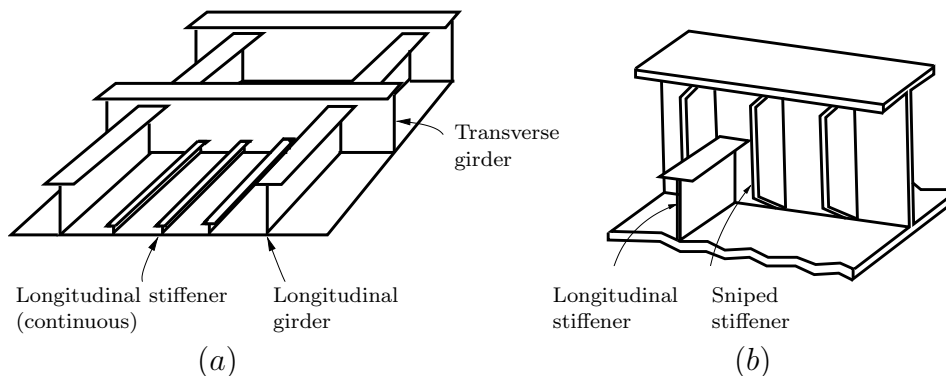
Examples of stiffened plates: (a) Stiffened plate enclosed by longitudinal and transverse girders, and (b) girder stiffened by sniped stiffeners.
